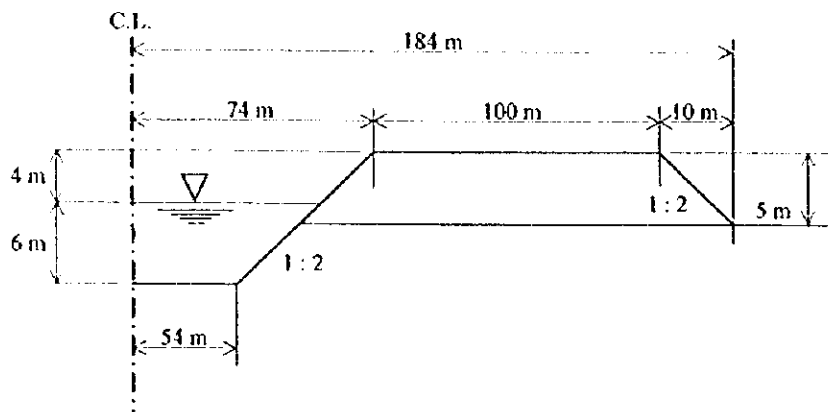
Standard Cross Section of Rewa Diversion Channel
